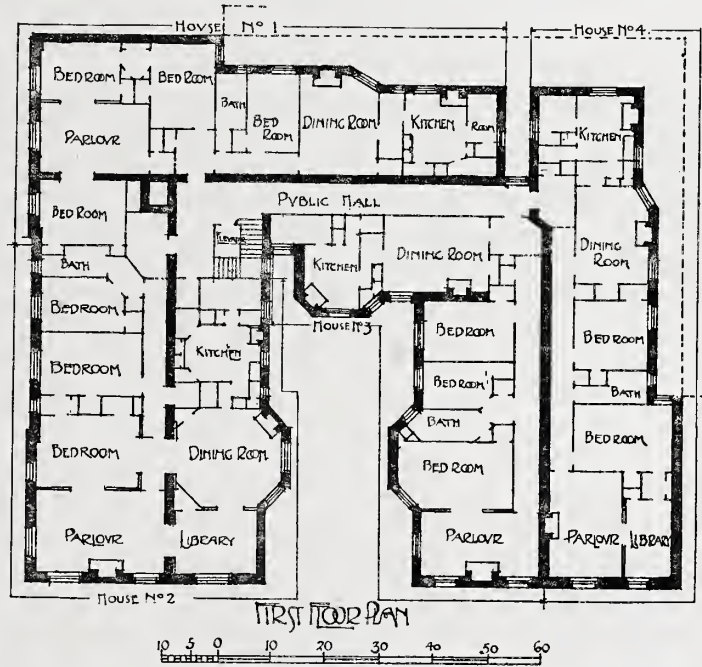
WELLESLEY APARTMENT HOUSES, EIGHTY-FIRST STREET, NEW YORK. (Messrs. Little & O'Connor, architects.)
